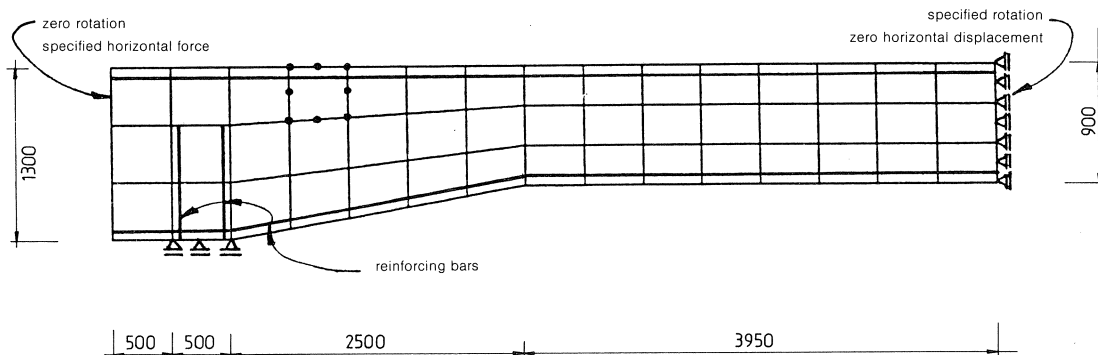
Finite element model of tunnel roof (dimensions in mm).
